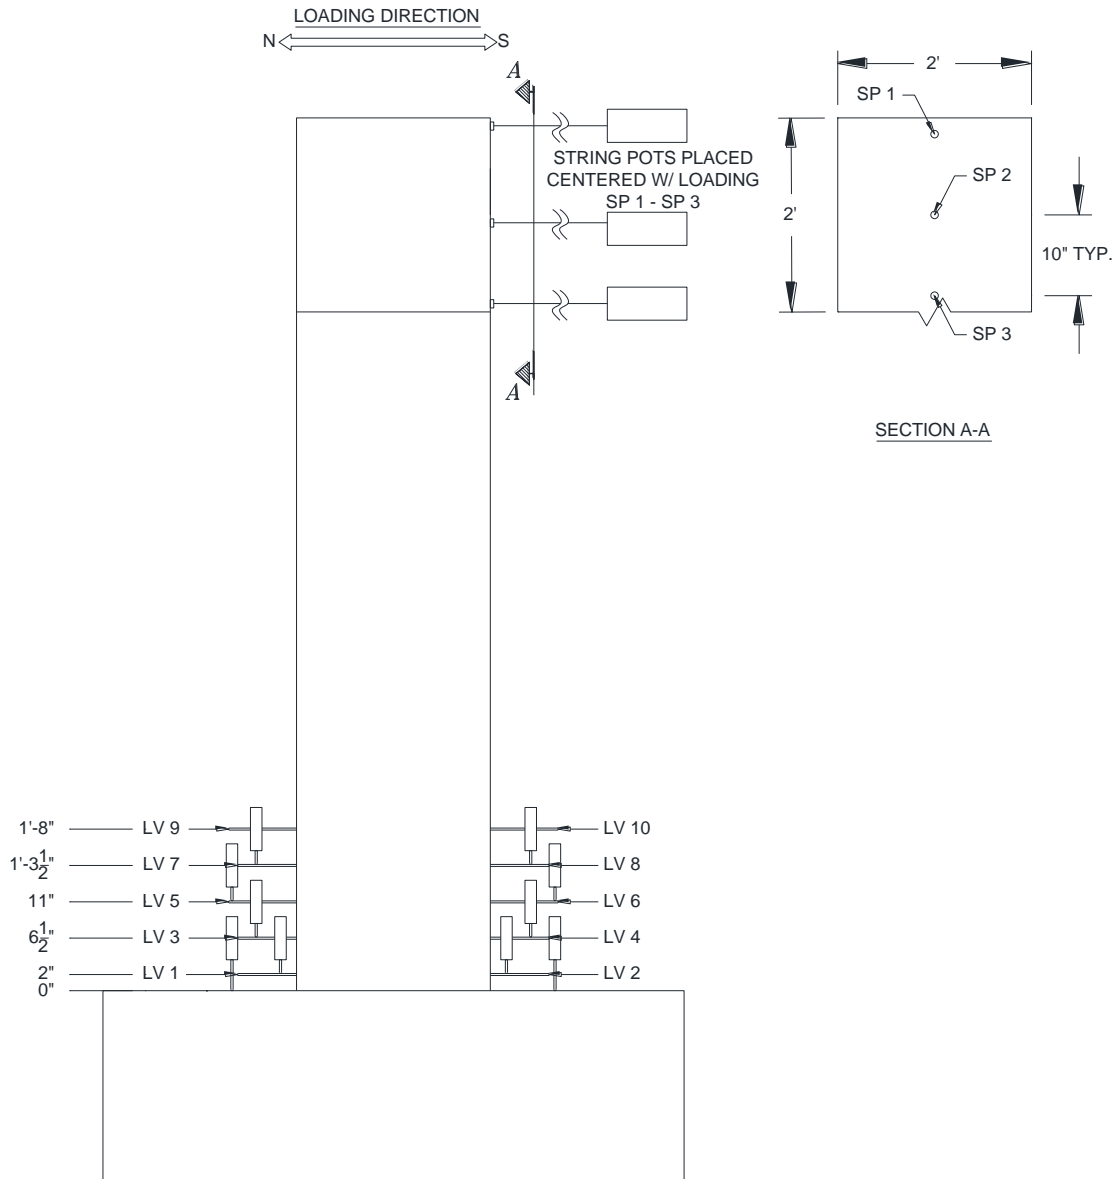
Typical LVDT and String Potentiometer Locations Used in Column Models
